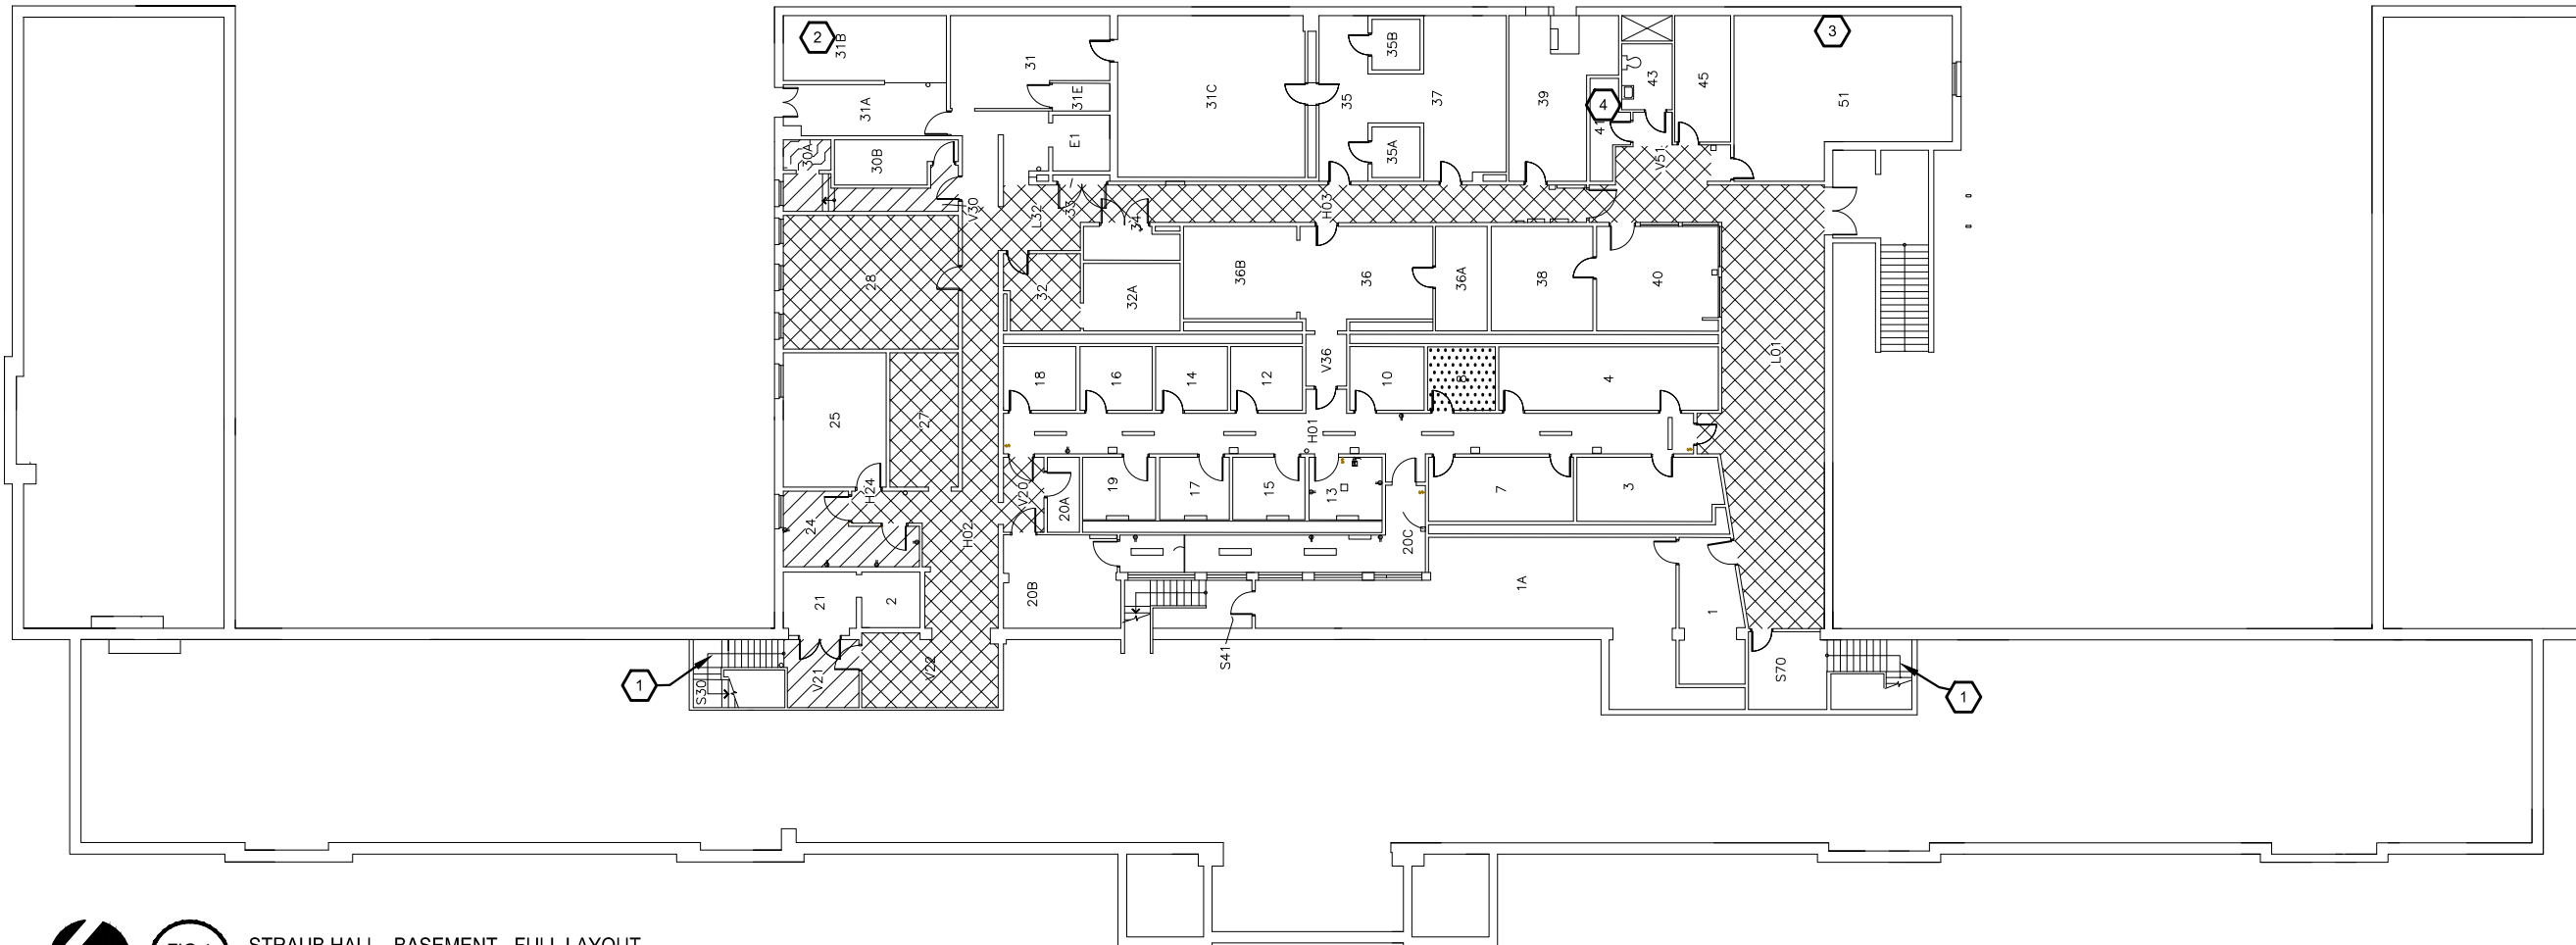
STRAUB HALL - BASEMENT - FULL LAYOUT
